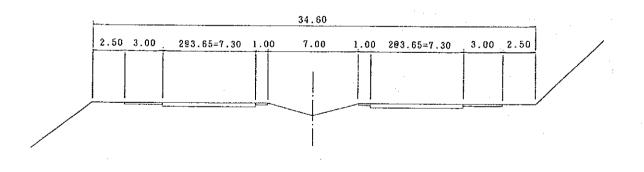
Cross Section of New Road for 40 Mill. Ton/Year
